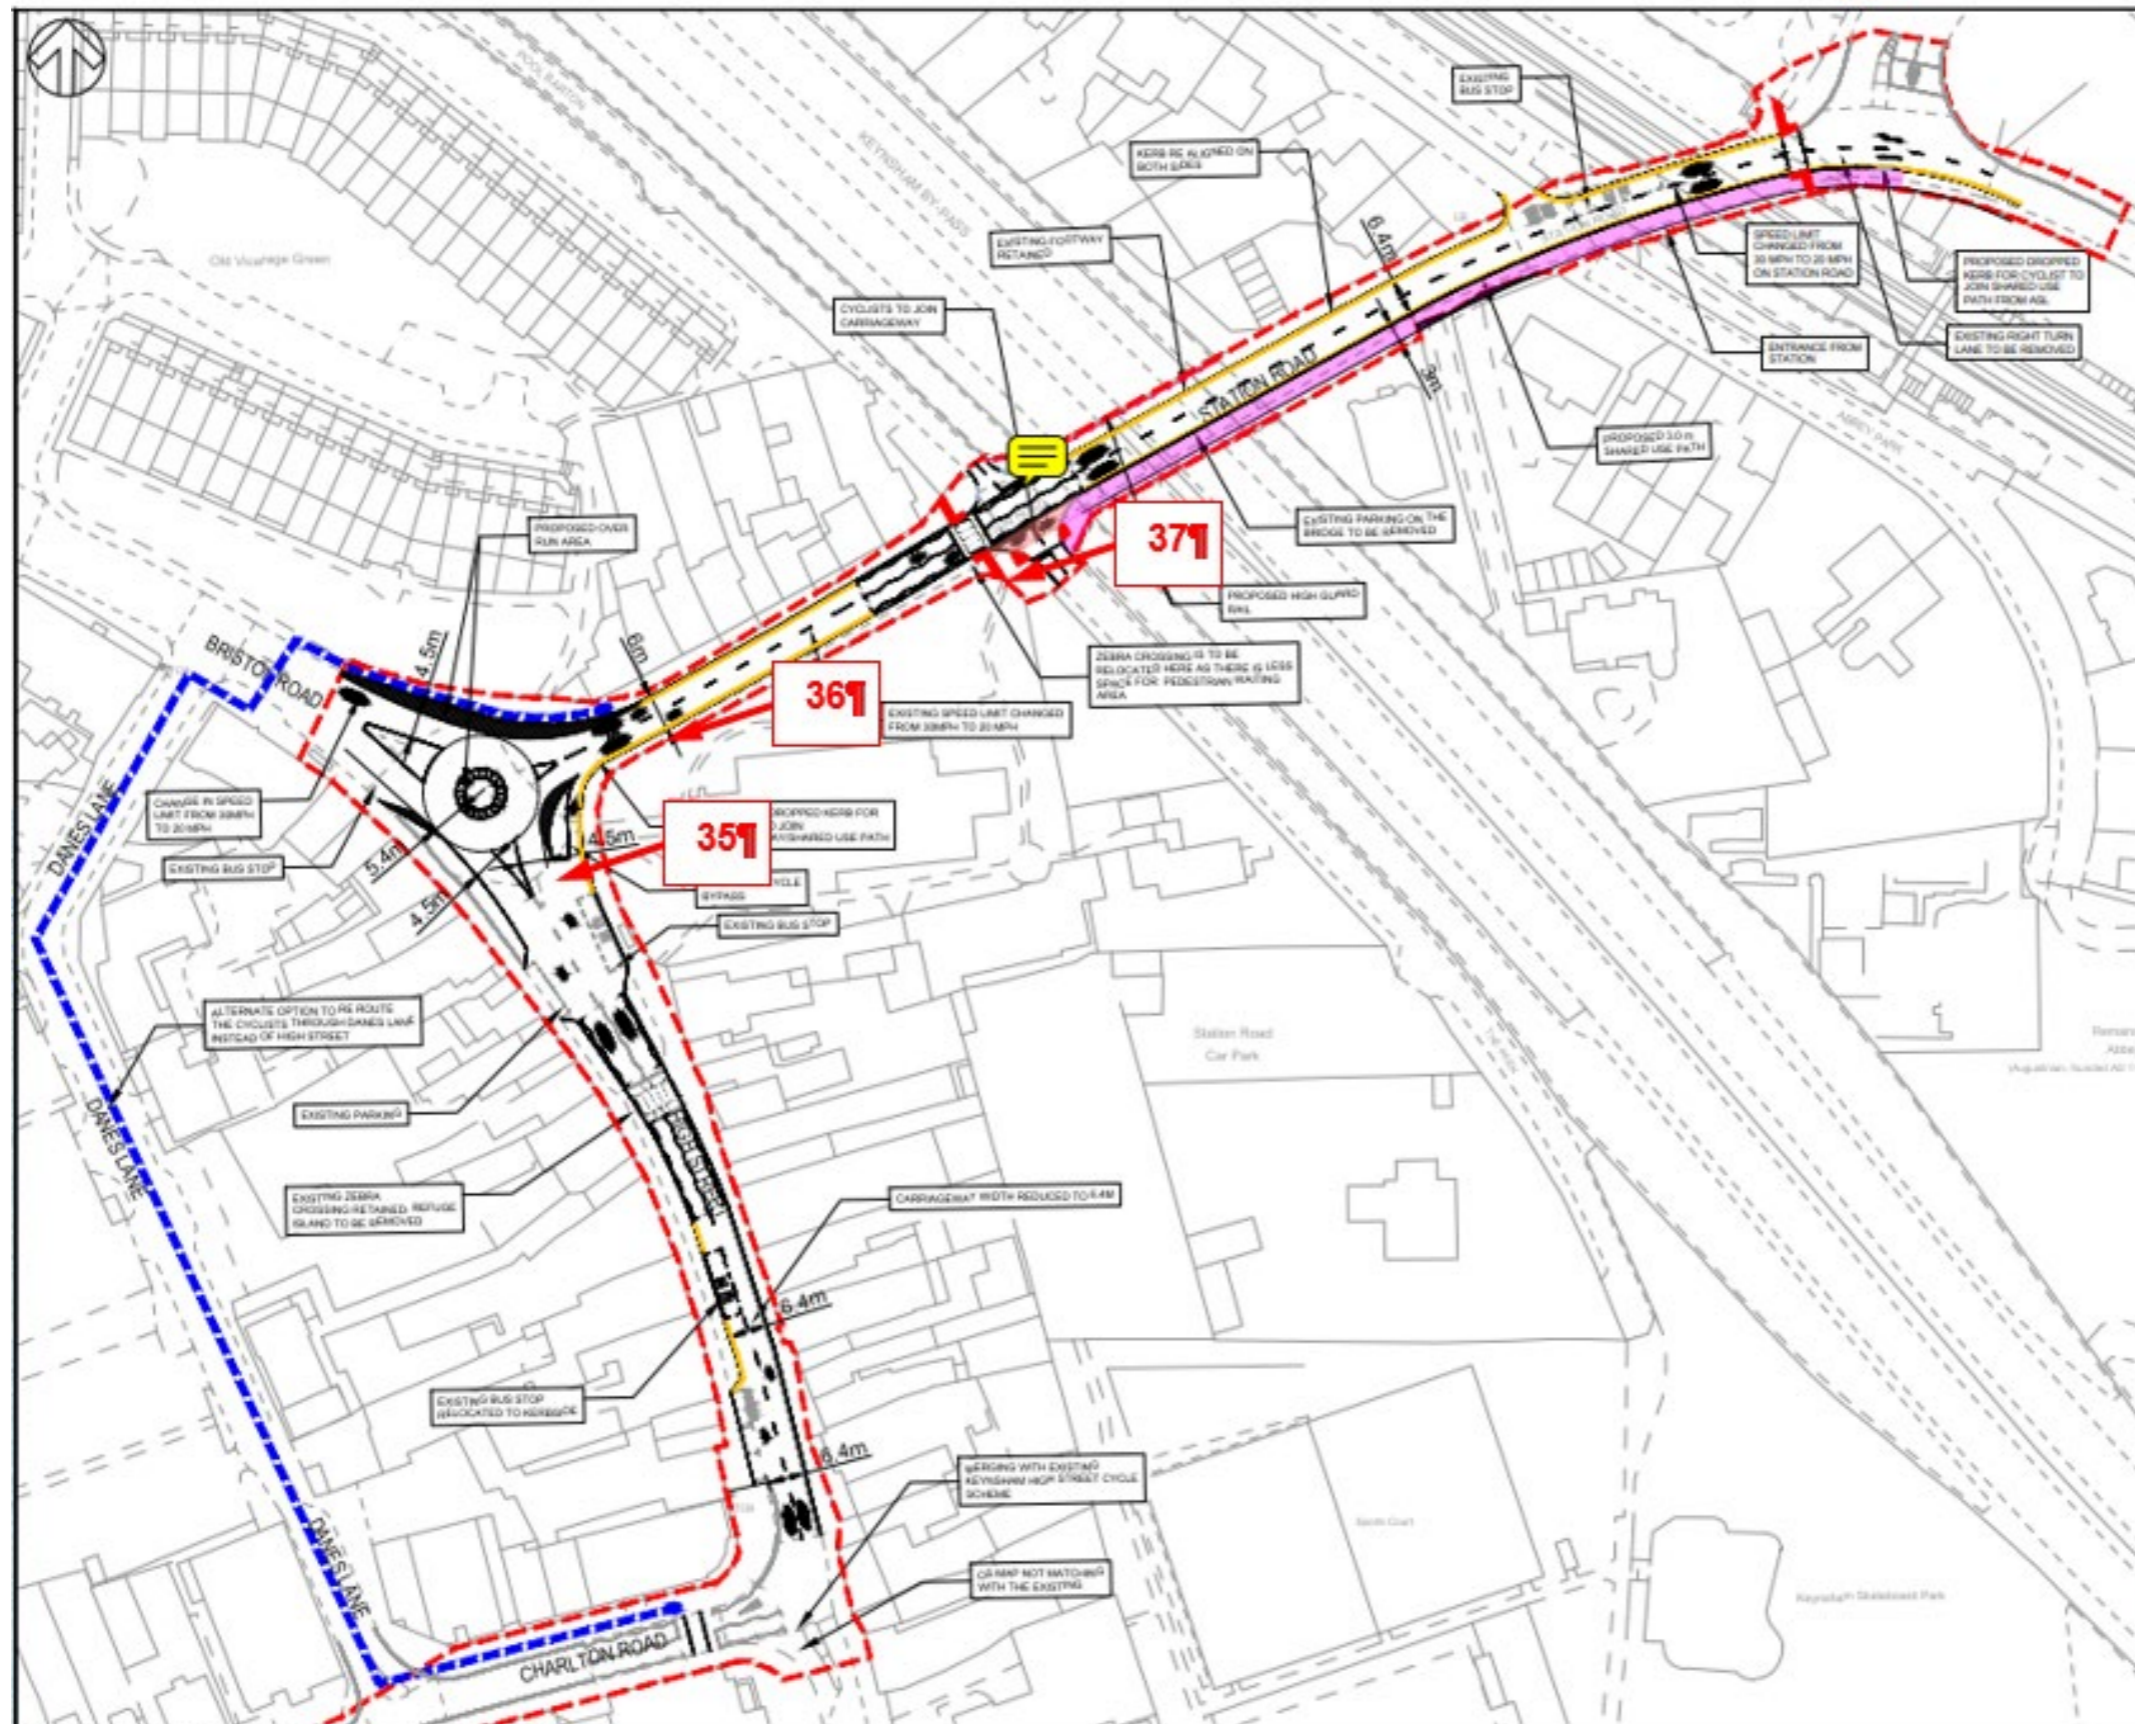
Community Connections Area 2 Road Safety Audit Problem Location Plan
